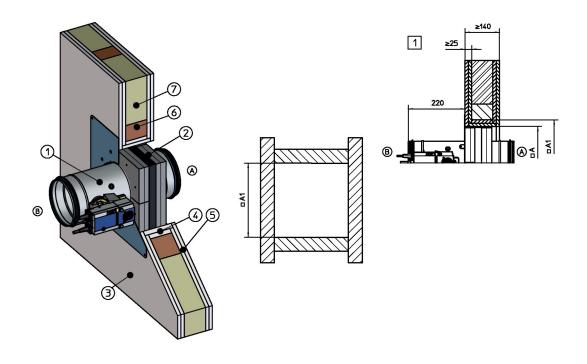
Dry mortarless installation into a lightweight partition wall with timber support structure using installation kit TQ
